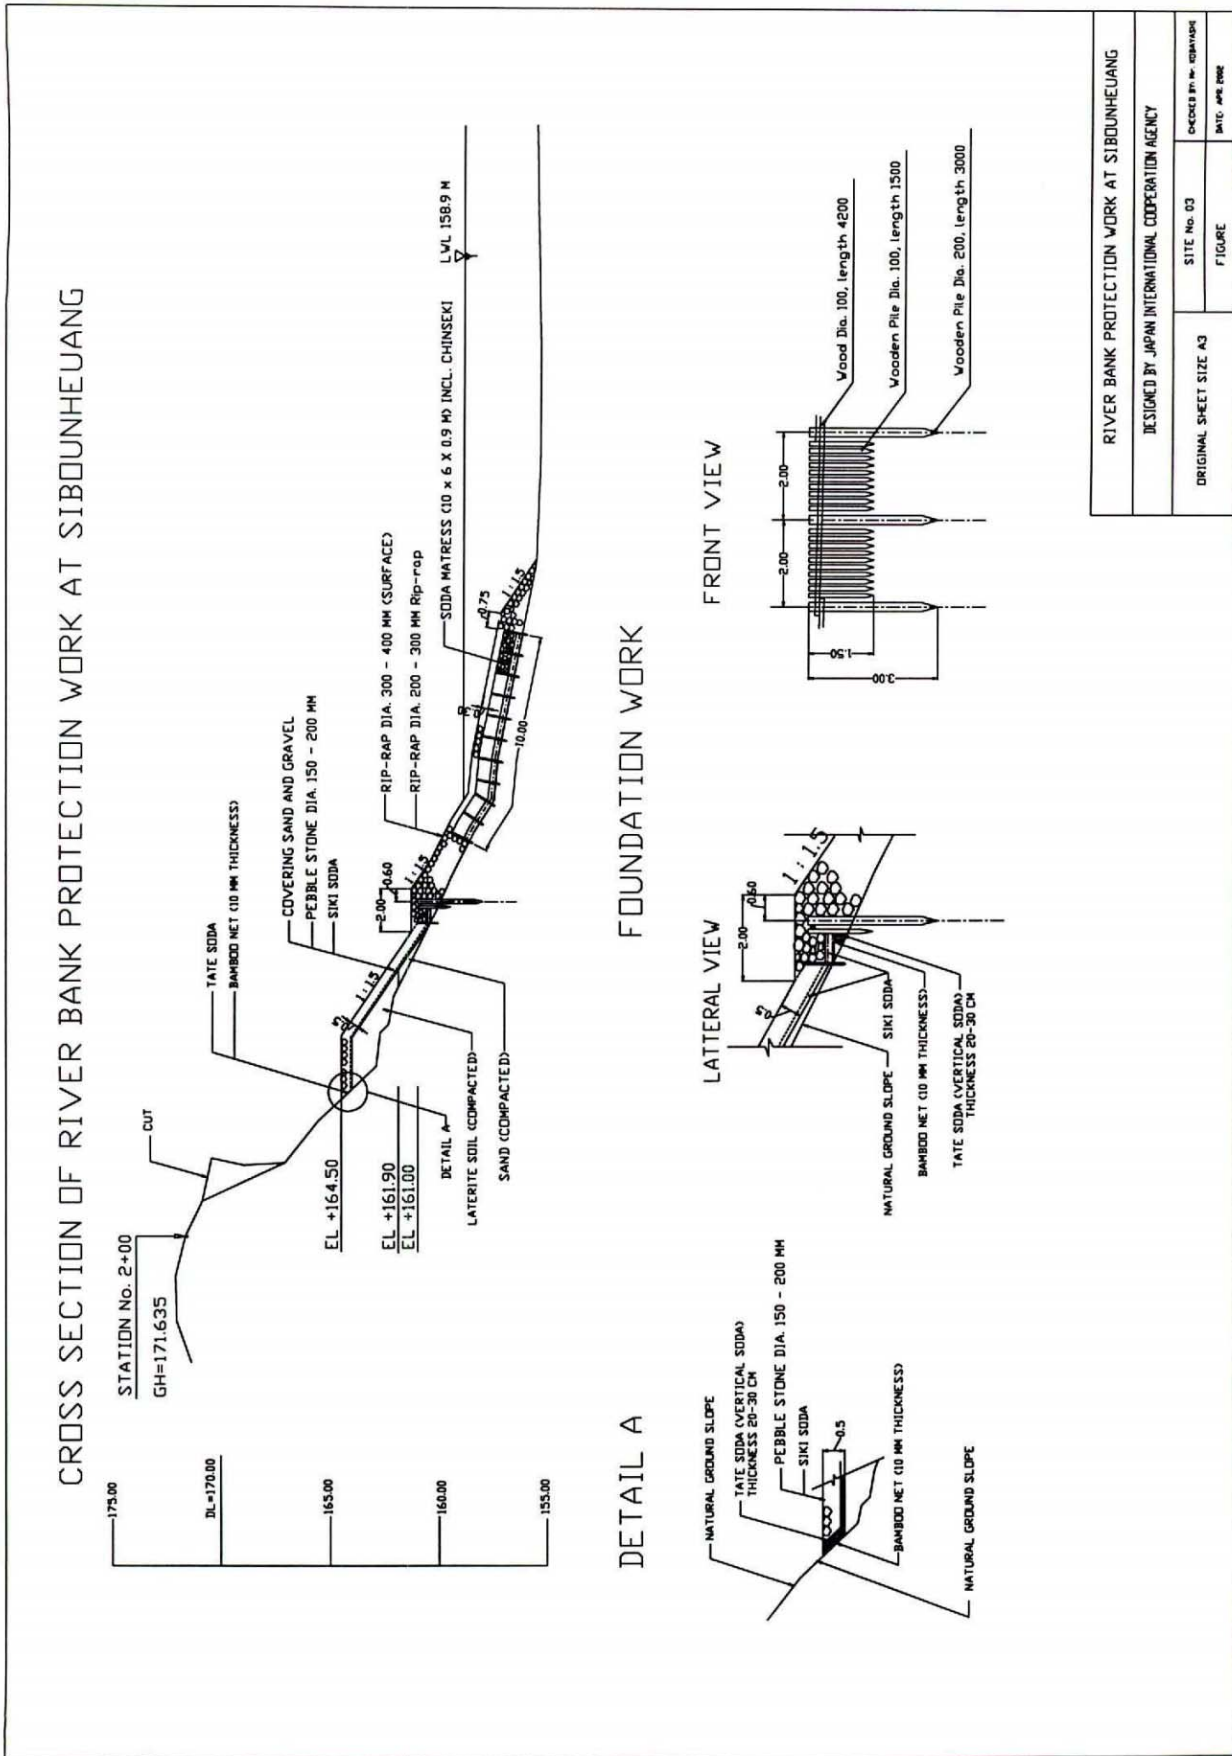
(5/5) Cross Section of River Bank Protection Work at Sibounheuang Site
